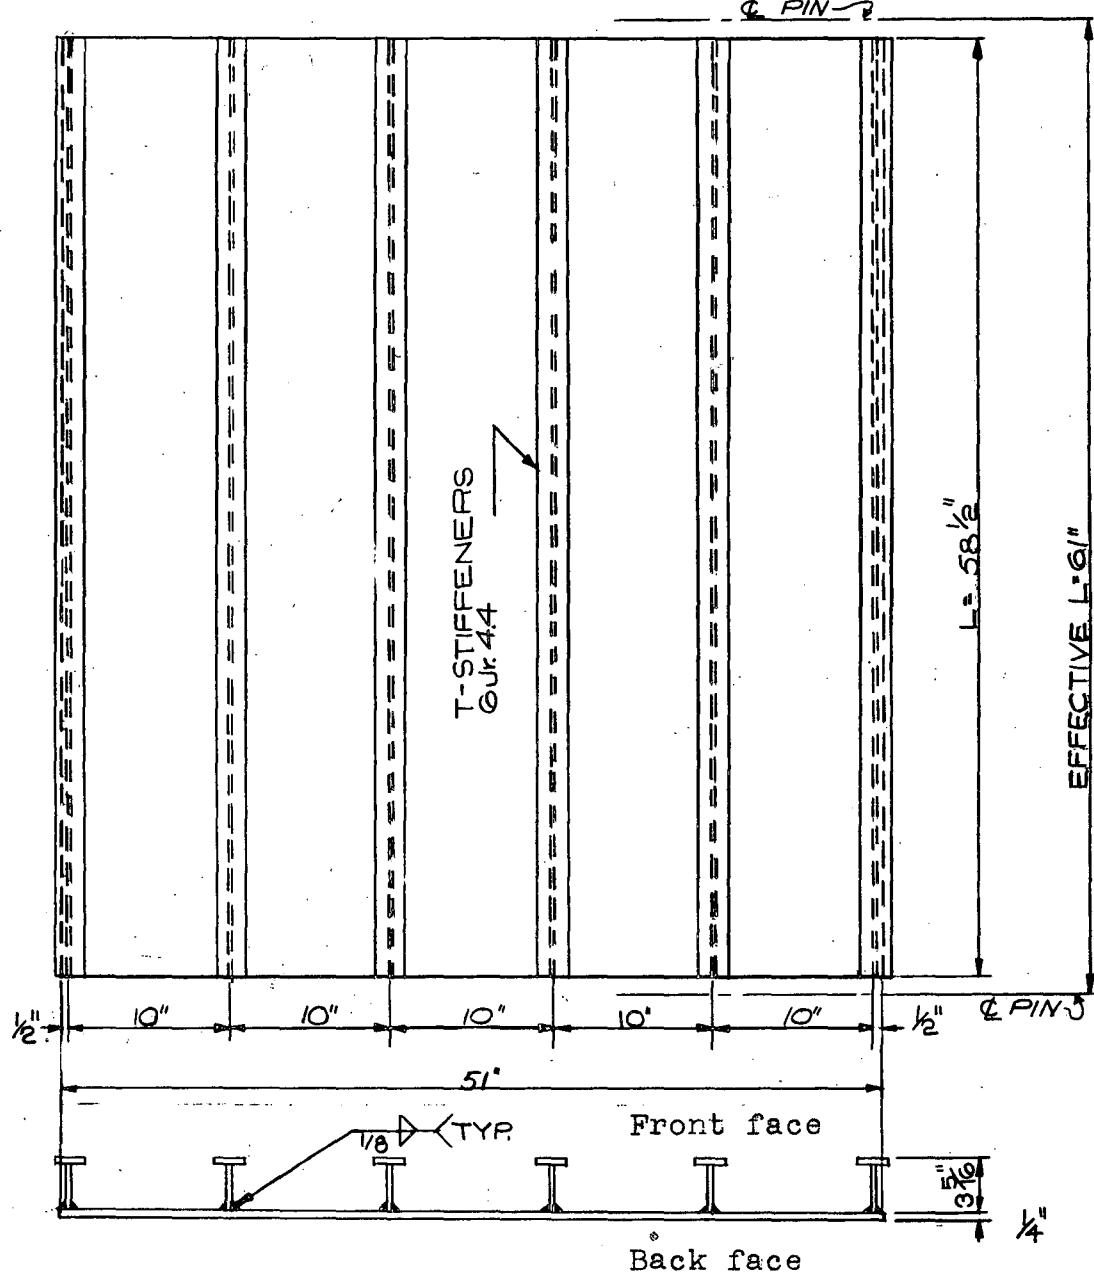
TEST SPECIMEN DIMENSIONS (T-6)
